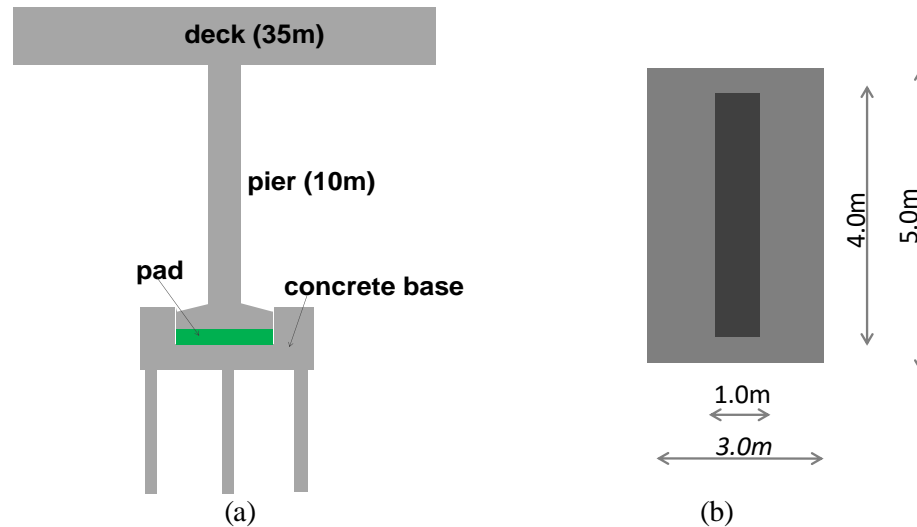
Description of the pier: (a) longitudinal section and, (b) plan of the foundation and the pier.
